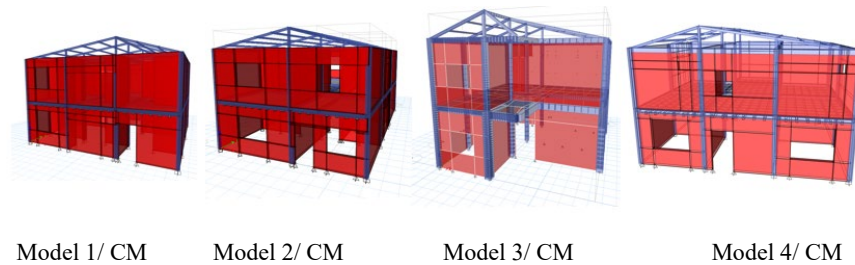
Modeling of houses with confined masonry walls to analyze.
